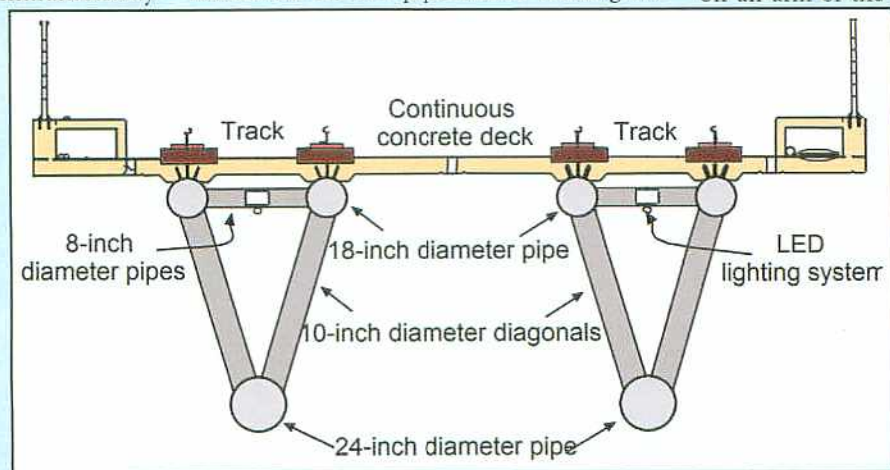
Triangular pipe truss design topped with continuous concrete deck over the two trusses
